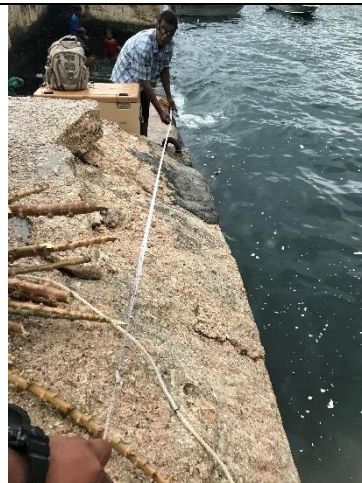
Jetty concrete steps structure 'chipped' at the edge. Damage measured length is 3.6m and 1m depth at an angle.
